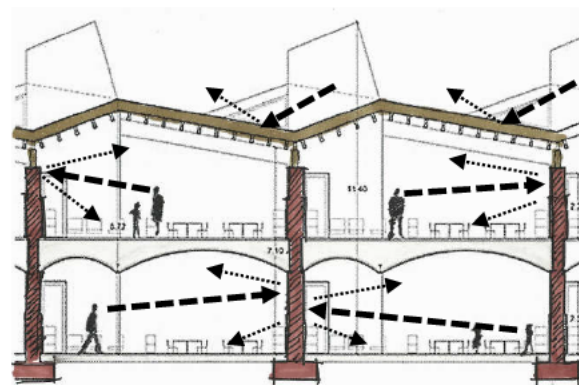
Thick masonry walls prevent noise. (Source: Author 2022)
